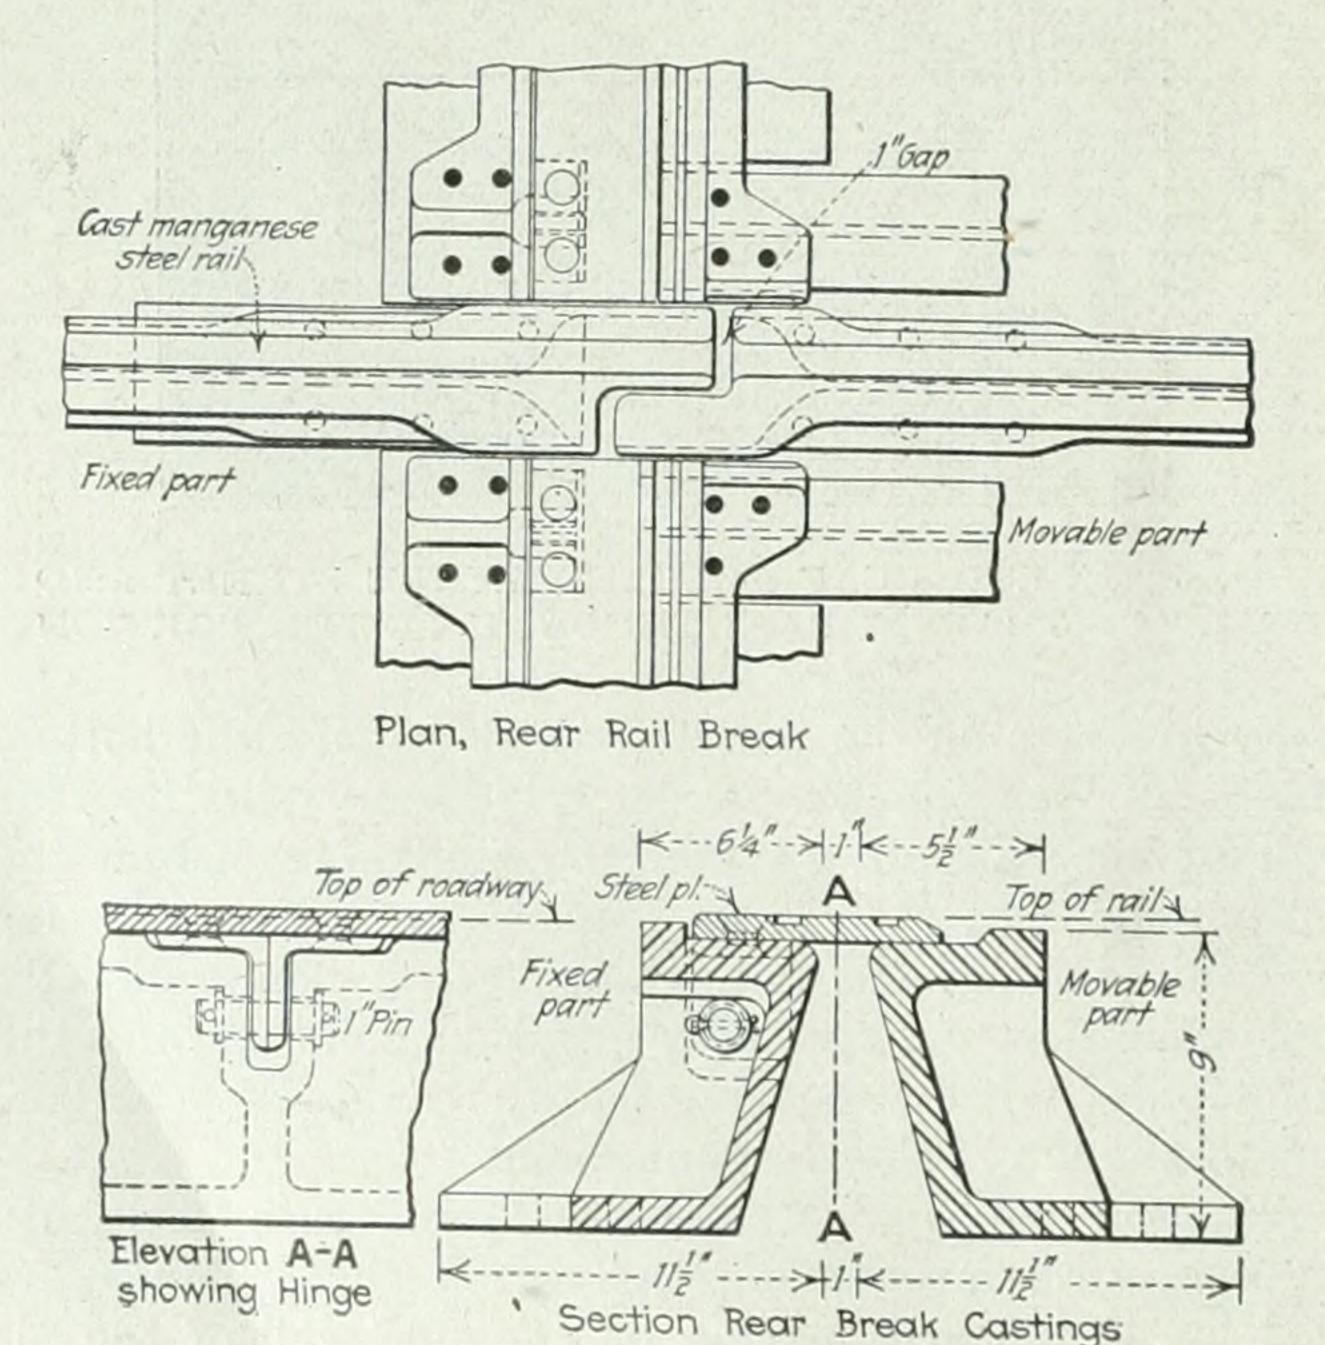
BREAKS IN CAR TRACK RAILS AND ROADWAY
